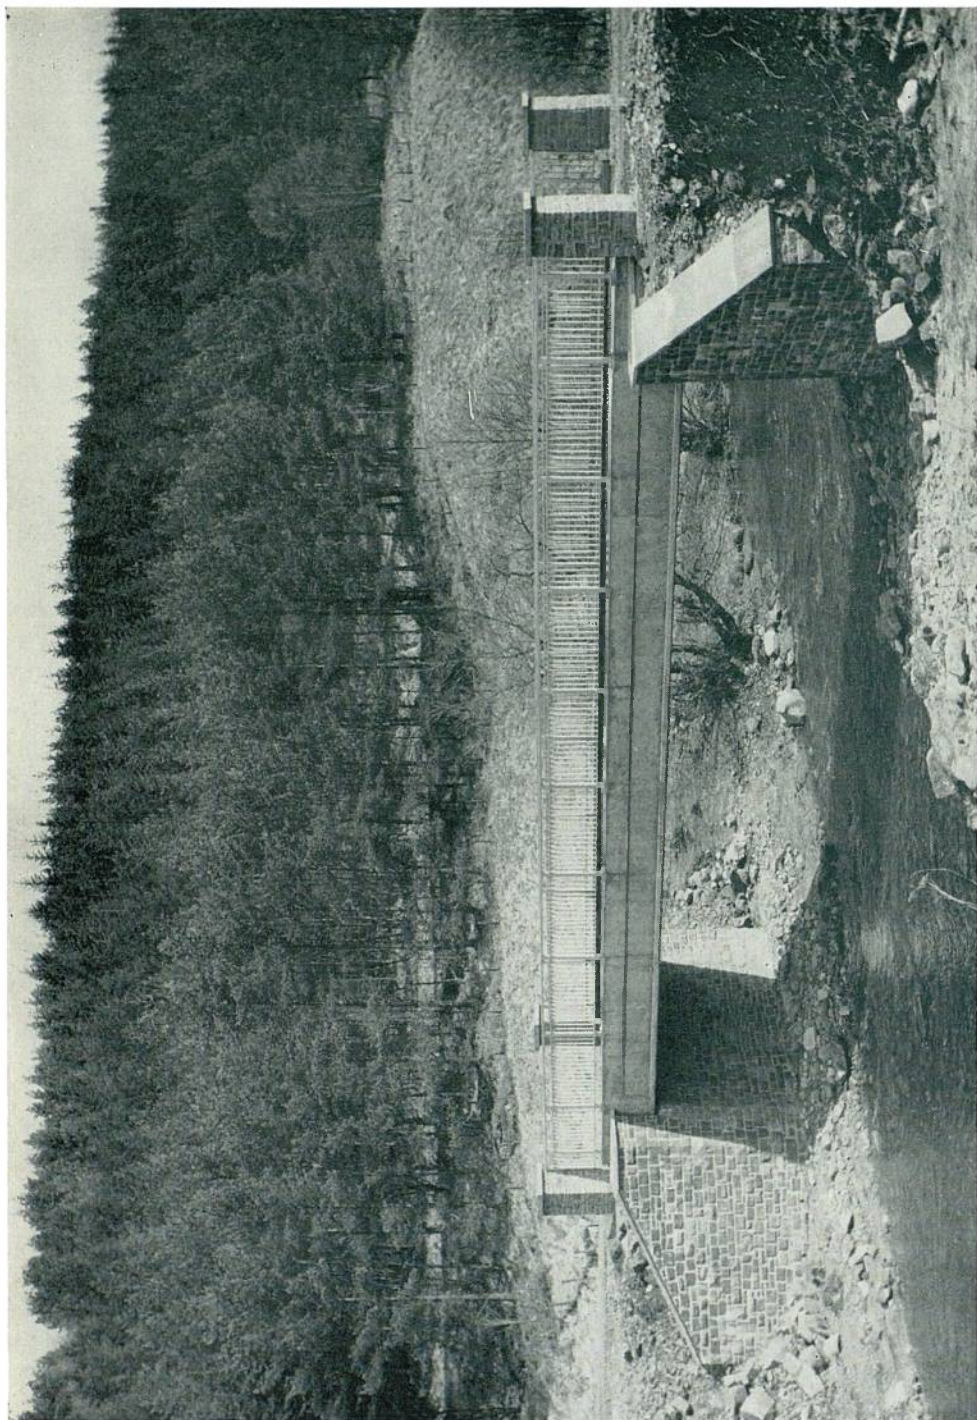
Rede Bridge in Redesdale Forest, Northumberland. The first lightweight concrete bridge to be constructed in Great Britain. Designed by the Commission's Engineers in conjunction with the Department of the Environment, and built by Commission Engineers in North East England Conservancy. Span 14.8 m, 3.6 m carriage way. The main advantage of this form of construction is the reduction of the deadload which also facilitates handling and placing the deck beams.
